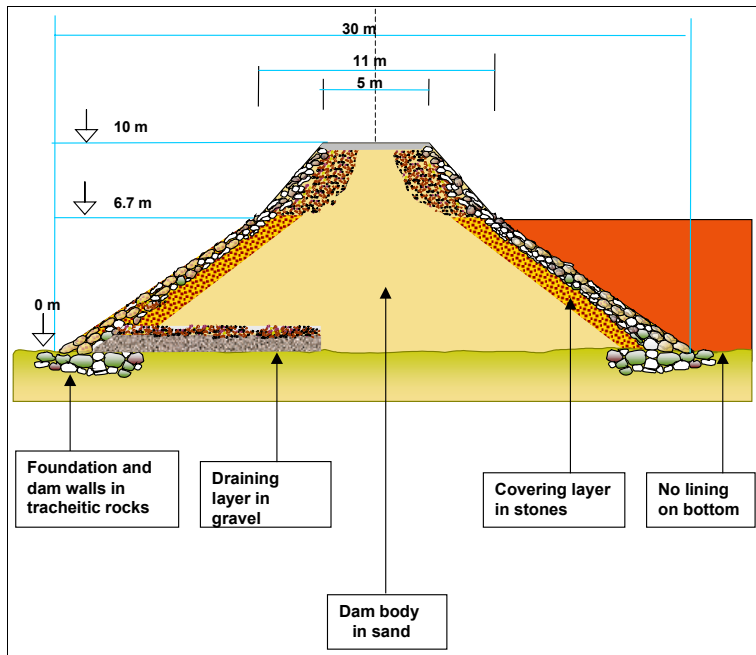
Cross-section of tailings dam at Sardinian site [33, Eurallumina, 2002]
